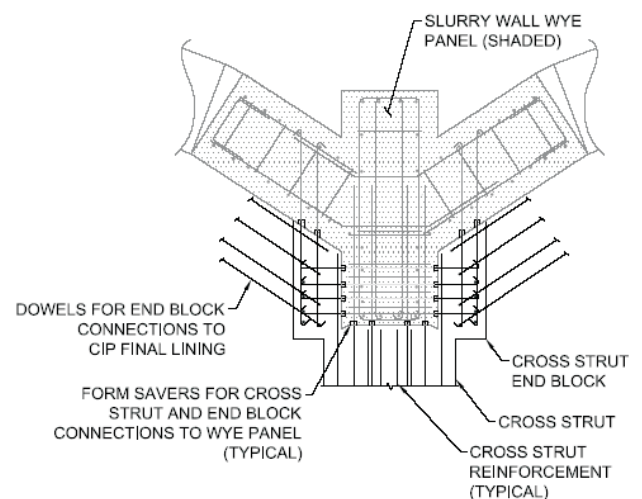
Influent pump station (IPS) wye panel cross strut connection.
